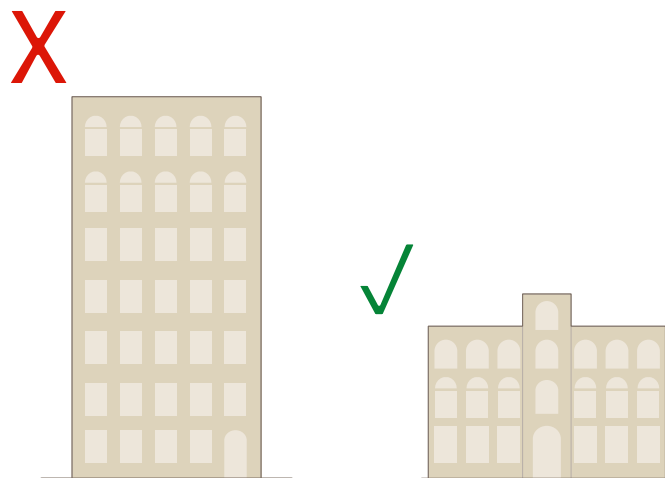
Break down building massing to better fit traditional architectural elements\
